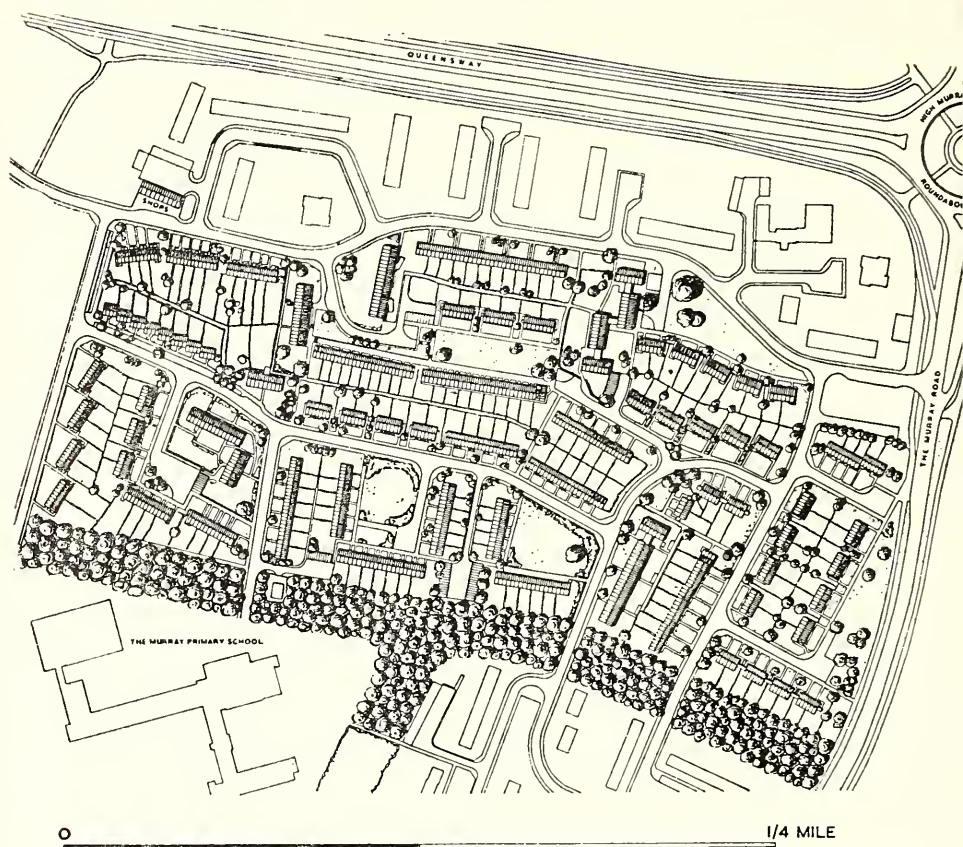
East Kilbride—a large scale plan of the north eastern corner of The Murray neighbourhood shown in Fig. 30. It is an interesting example of cul-de-sac planning.
